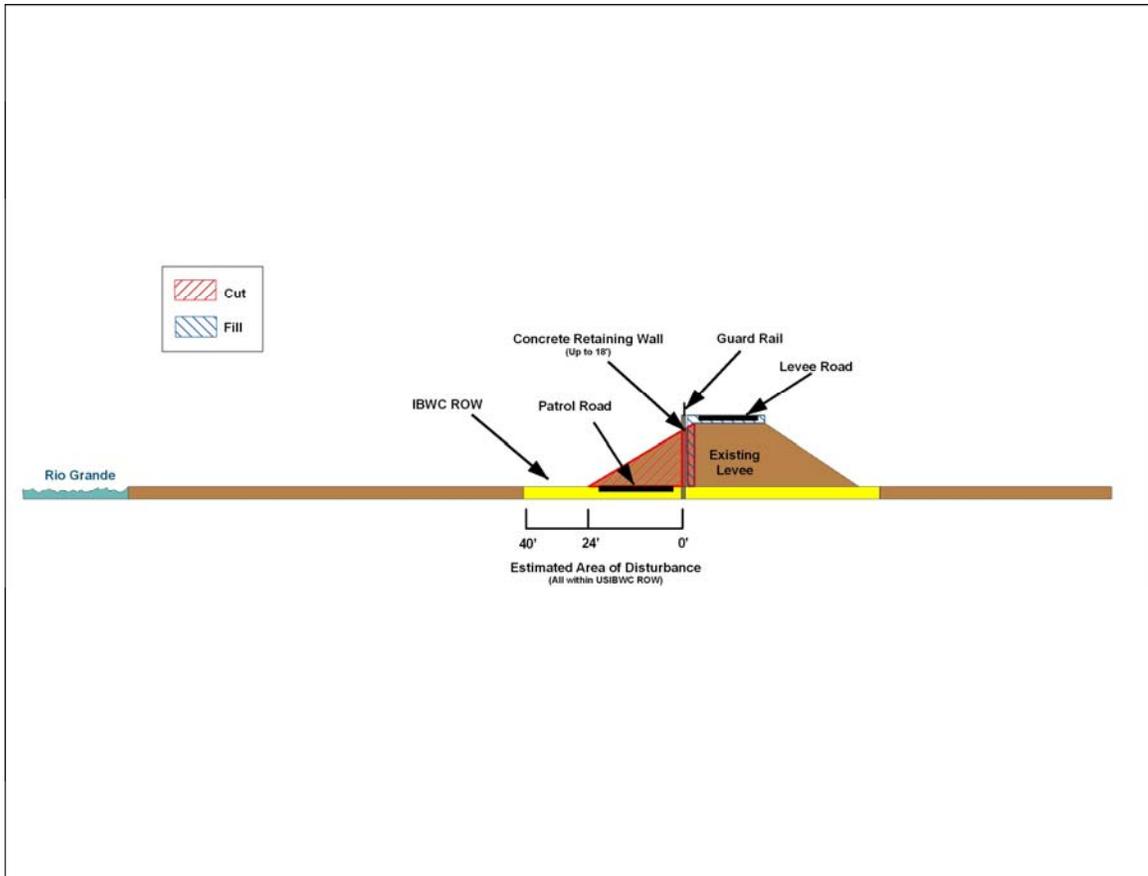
Cross-Section of Concrete Levee Retaining Wall
